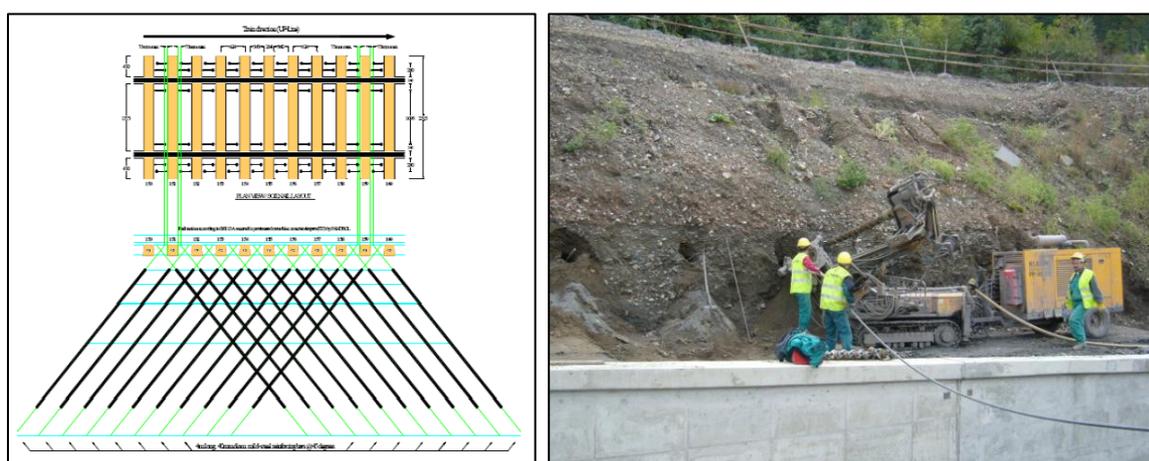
LEFT: AN EXAMPLE OF SOIL NAILING EXECUTED FROM THE TRACK (KONSTANTELIAS, 2003); RIGHT: STABILIZATION OF A RAILWAY EMBANKMENT WITH SOIL NAILING (INNTRACK, 2008)
